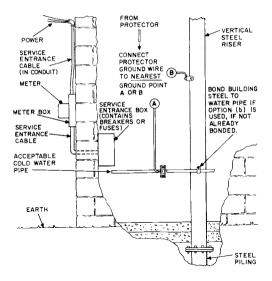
Acceptable Water System or Building Ground—Power Service Not Grounded or No Power on Premises
